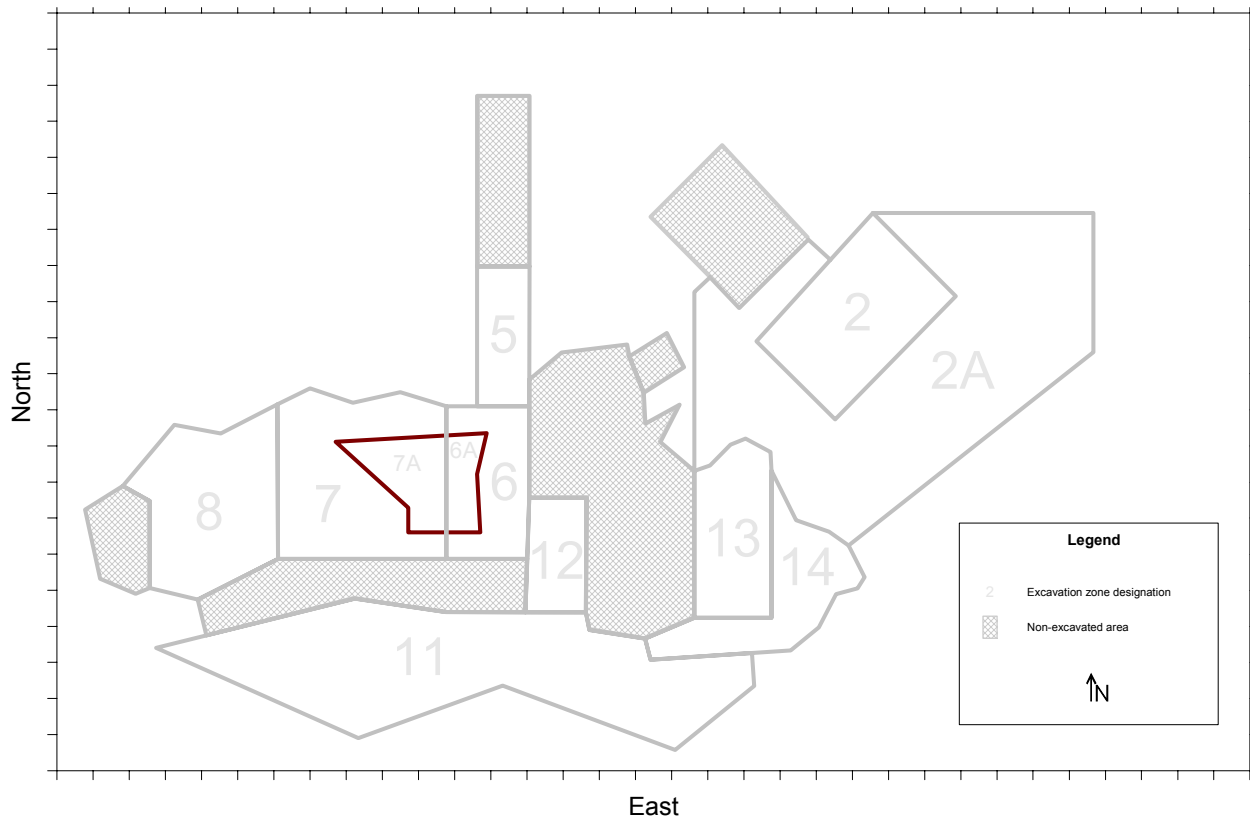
Central Facilities Area, CFA-04 remedial action excavation zones.
